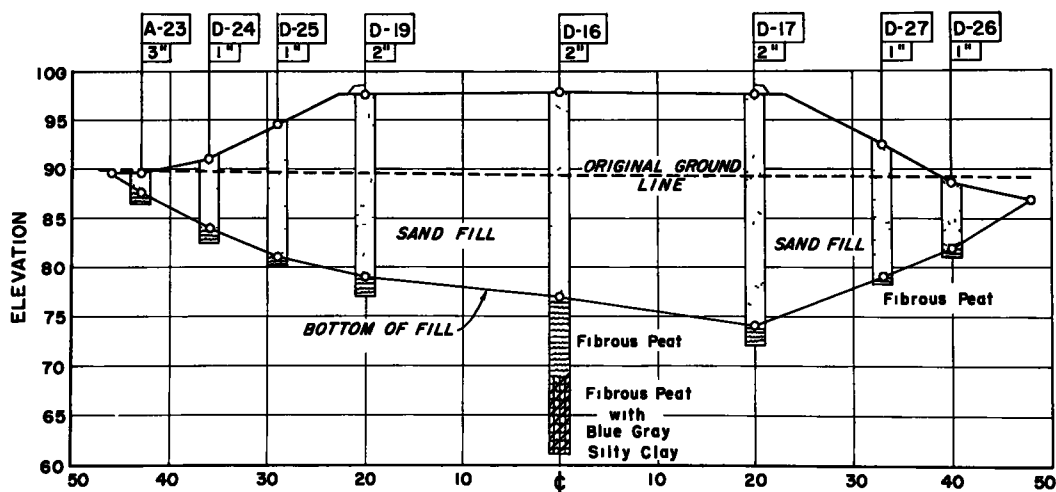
Cross-section of fill in sand drain area: North Approach Antioch Bridge, X - Sac. - 11 - C, Station 18 + 75.
